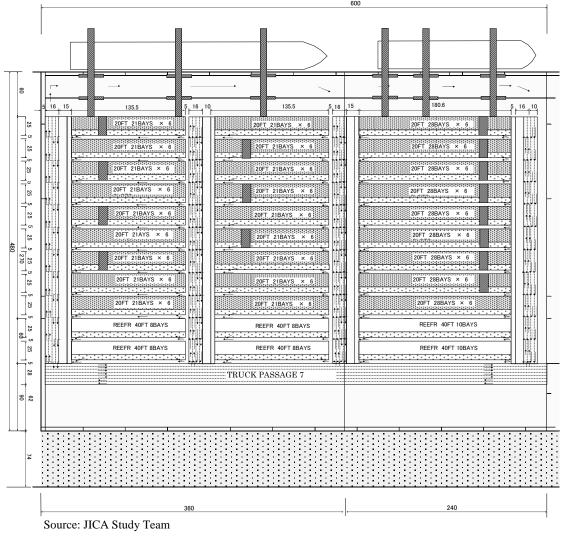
Container Yard Layout (360m and 240m)
